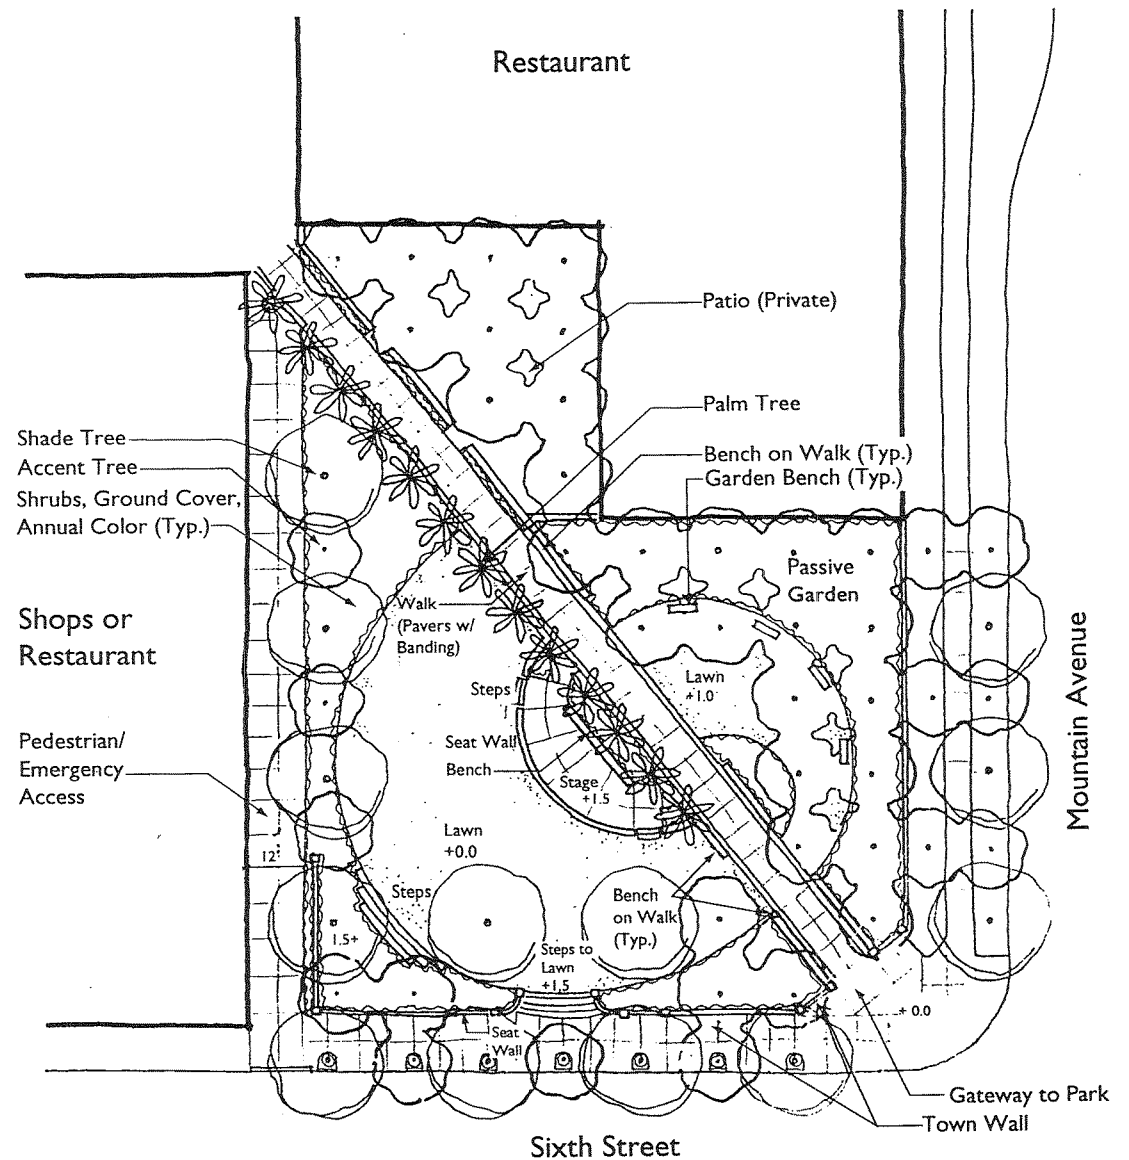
, Gateway Park at northwest corner of Mountain Avenue and Sixth Streets. (The Gateway Park on the northeast corner should be symmetrical and largely identical).
